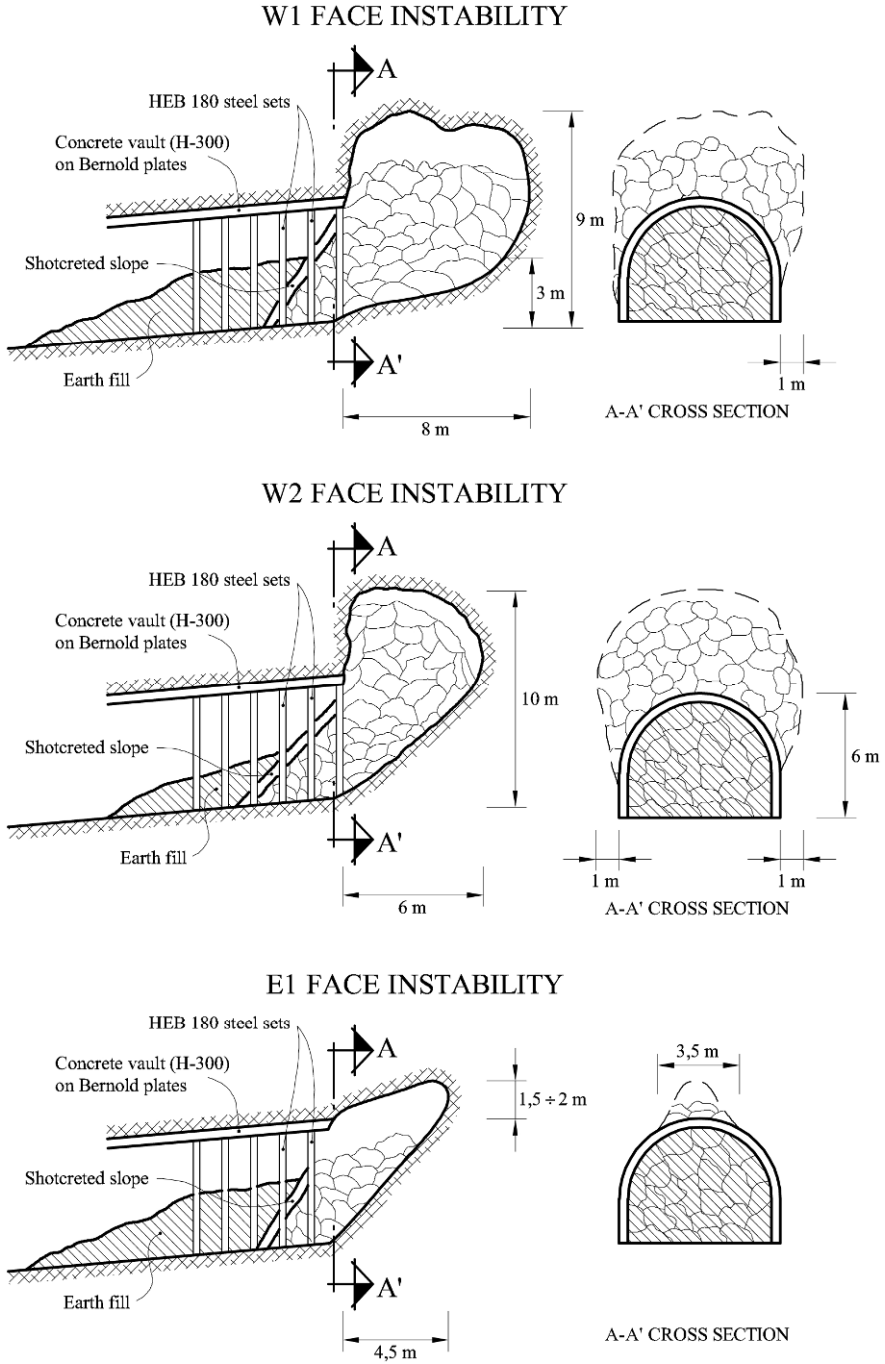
Sketches of the tunnel face failures reported by the engineer in charge.
